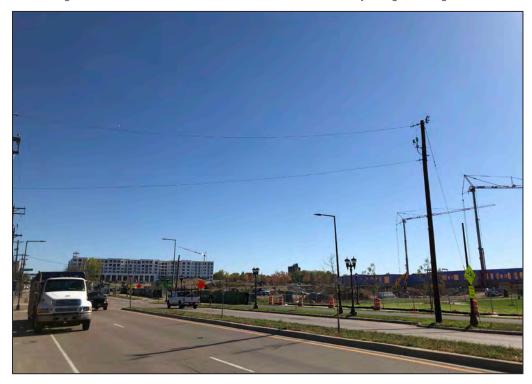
View towards Parcels A and B from east end of Intercity Bridge, Facing Southeast
